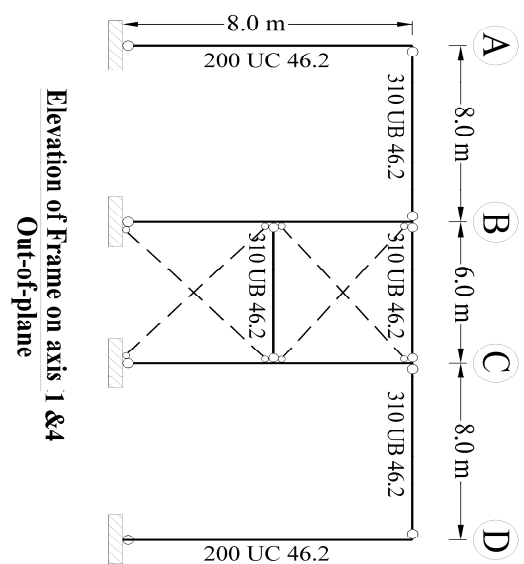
QUESTION 2(Design of beam-columns)(65 Marks)
